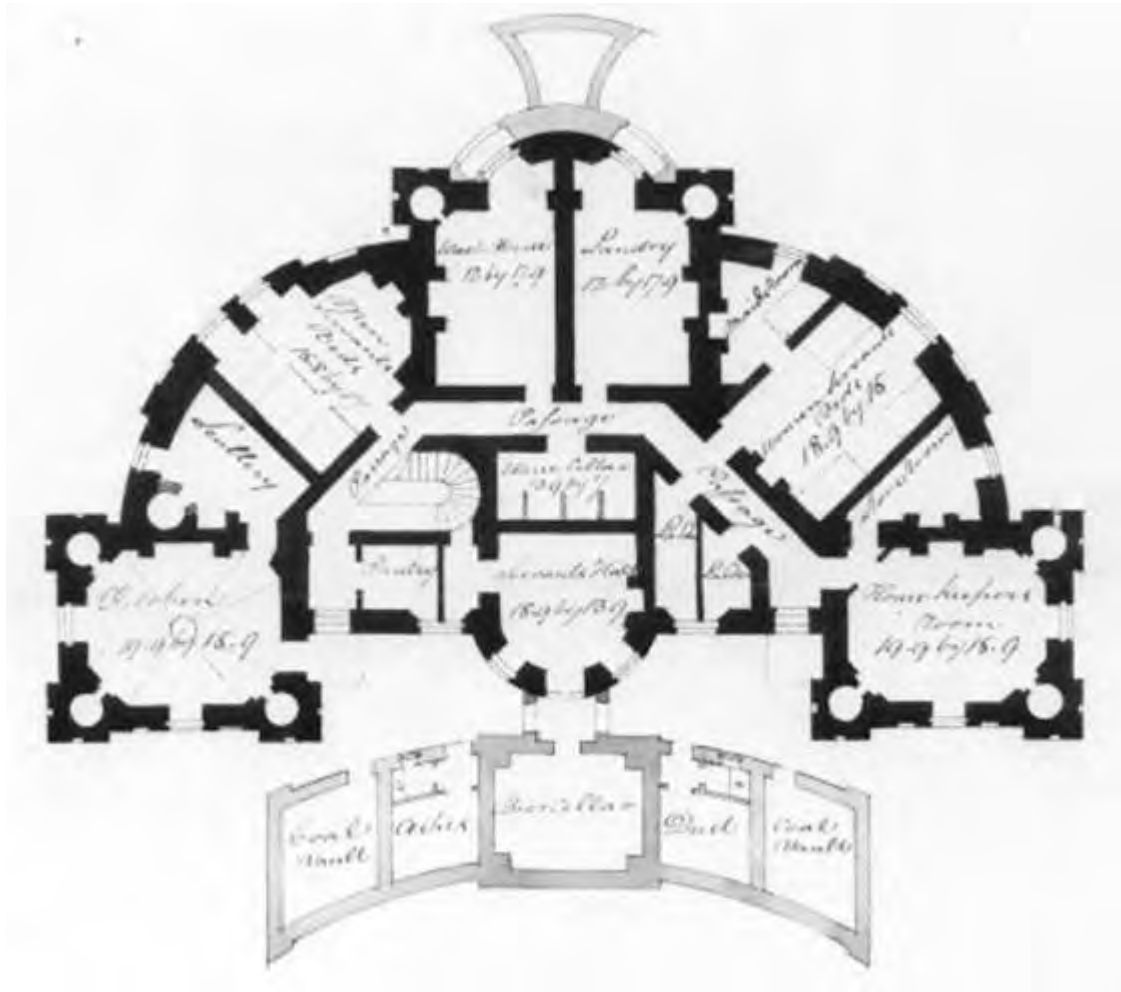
Plan of basement floor, Robert Adam c1791 *SJSM
